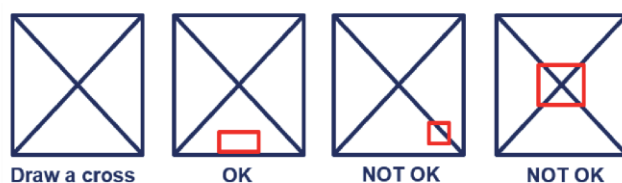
Tile cuts should not be where it touches any of the lines on a cross formed by the corners of the tile
